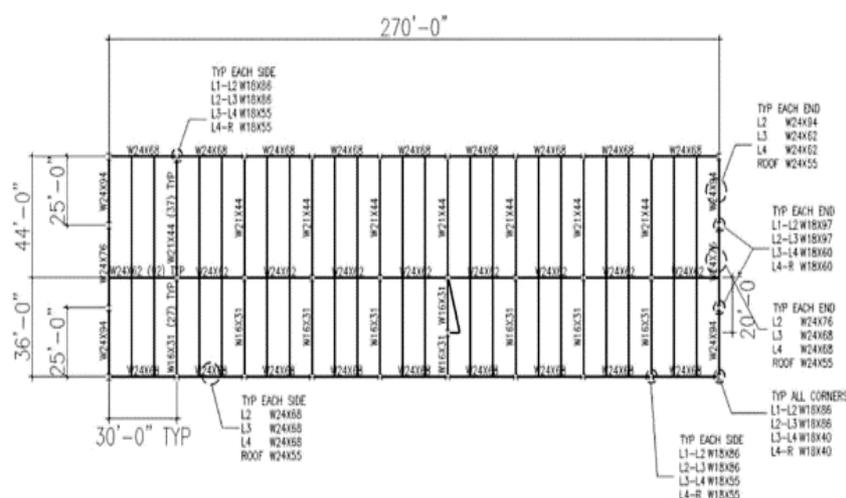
shows the plan of the building whose area is 8027 square meters. This example is related to a 4-storey steel building with moment frame, in which AP and ELR
